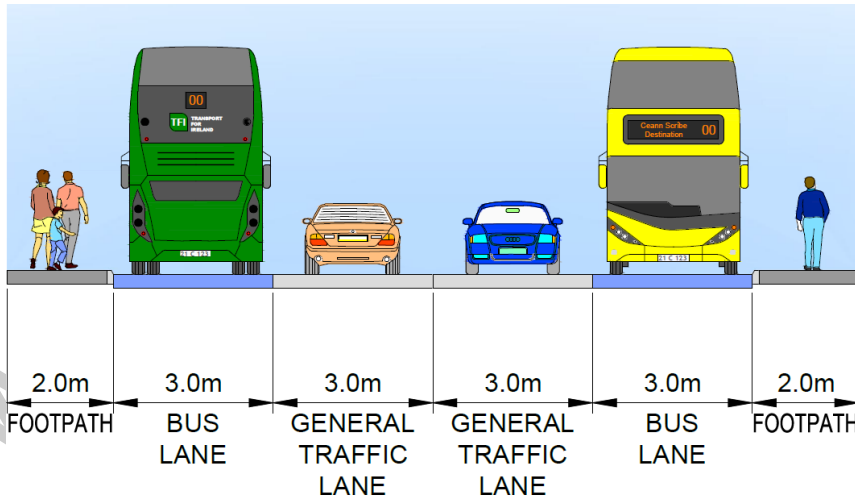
Section 1, Proposed Option 2 – Cross Section B-B
